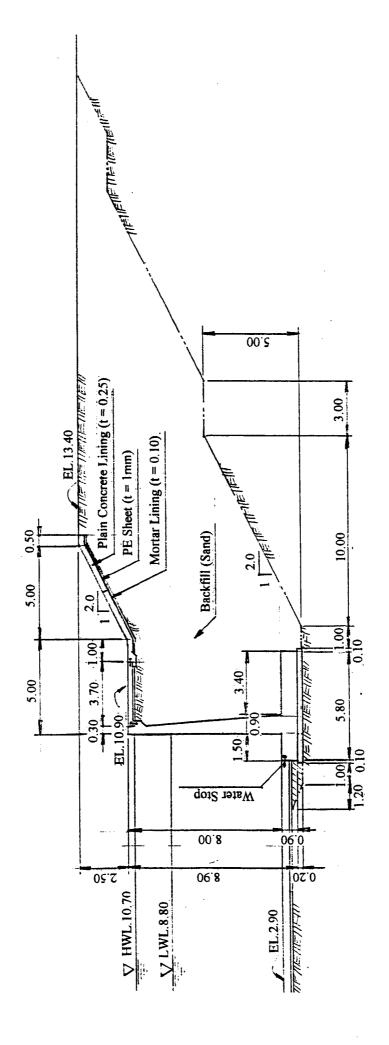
Typical Cross Section of Inverted T-Shape Type (2)
